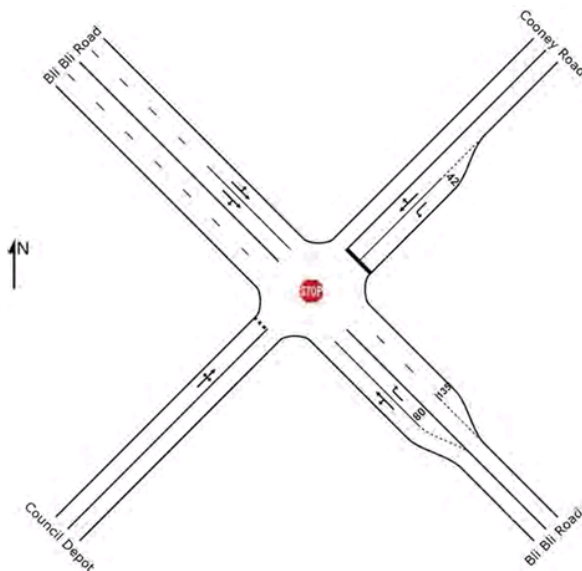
Bli Bli Road / Cooney Road Intersection Configuration
